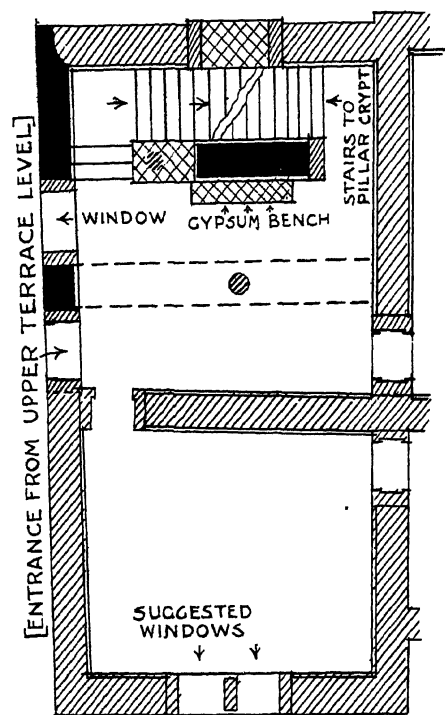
PLAN OF FIRST FLOOR OF WEST SECTION OF SOUTH HOUSE.
